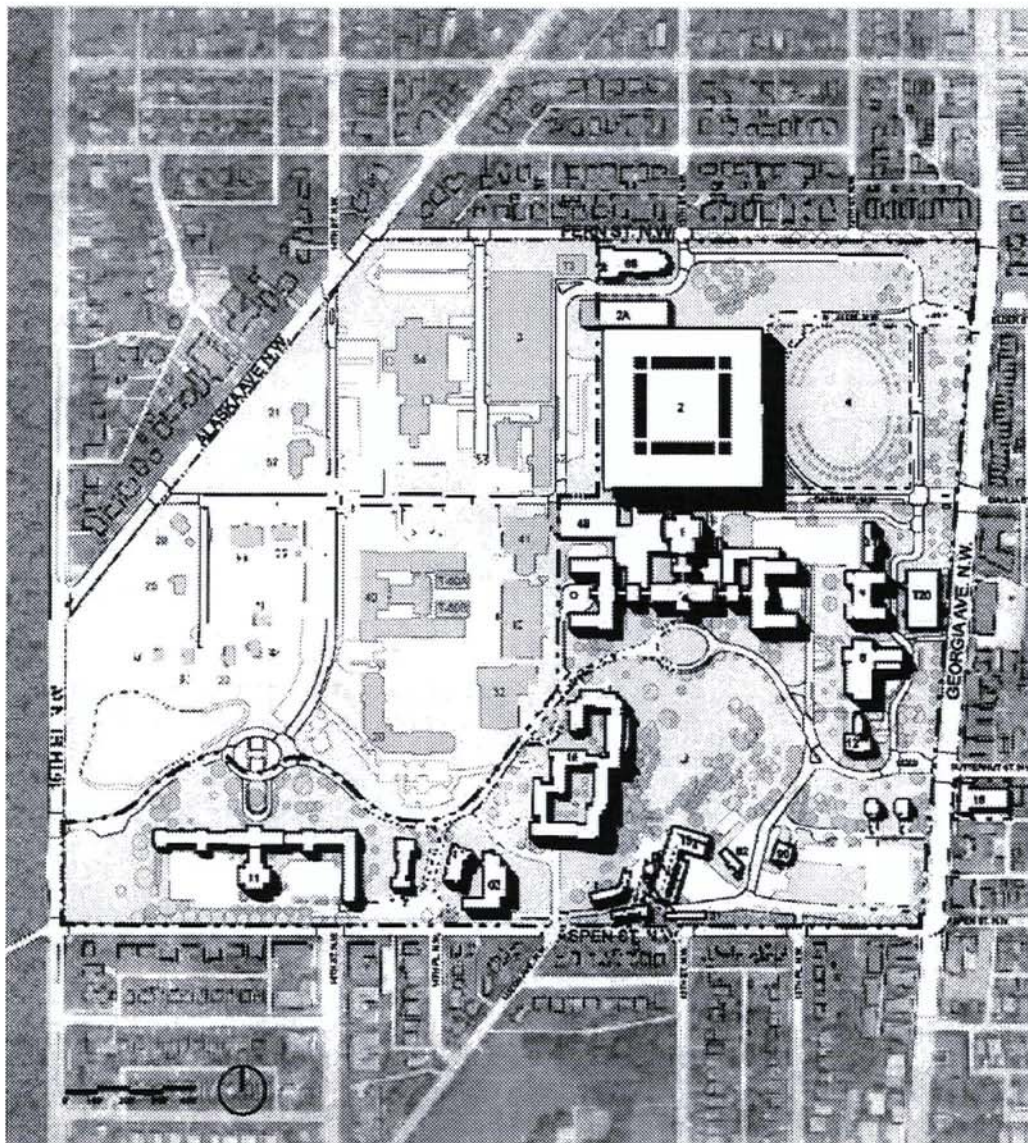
Existing Buildings on LRA Site. Source: Perkins+Will
